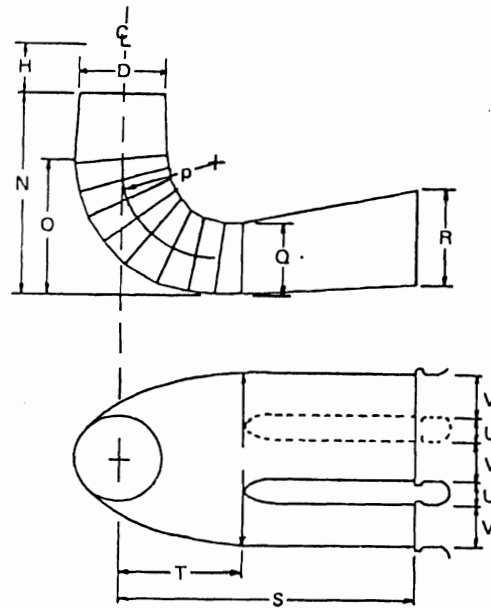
Dimensioning layout for typical draft tube for Kaplan-type propeller turbines.
